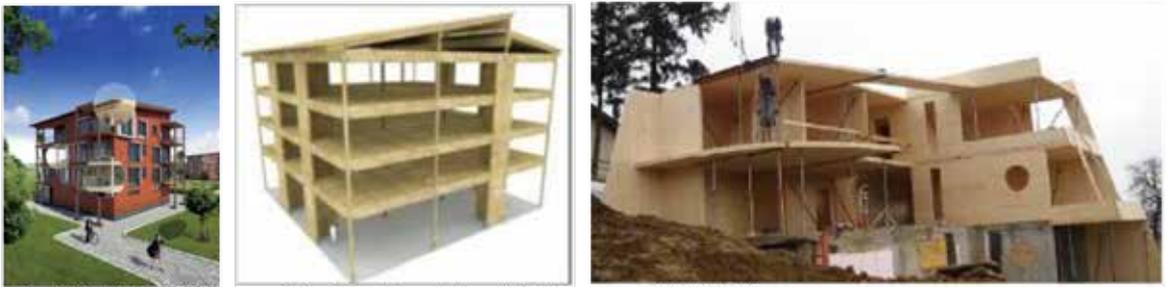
Multi-Storey Timber Residential House /10/ /11/
